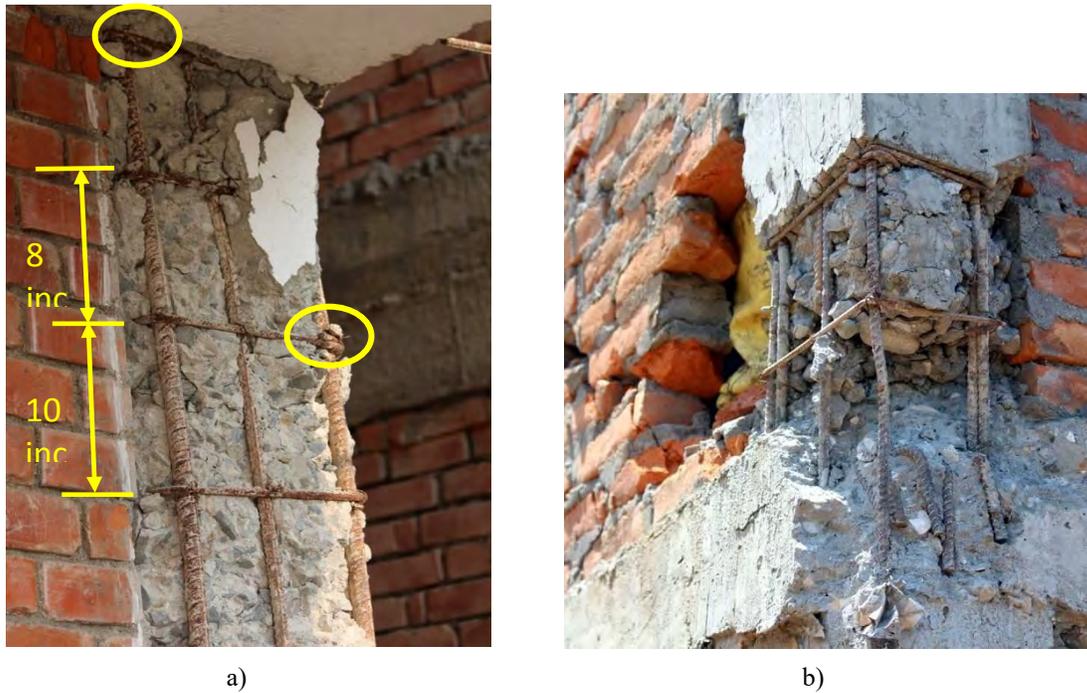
Inadequate RC construction and detailing: a) excessively wide tie spacing and 90 degree anchorage and b) lap splices provided at the floor level (Photos: Bishnu Pandey)
